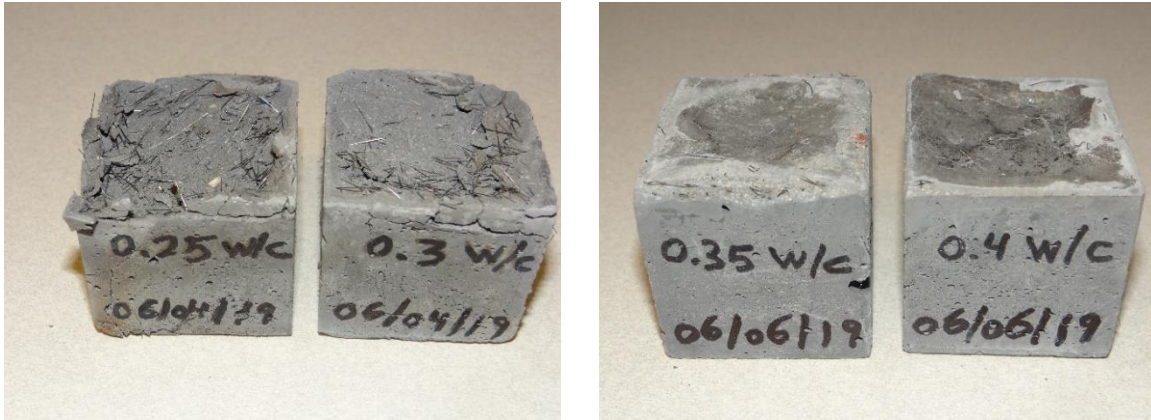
Spalling of UHP-FRC, mix 10
